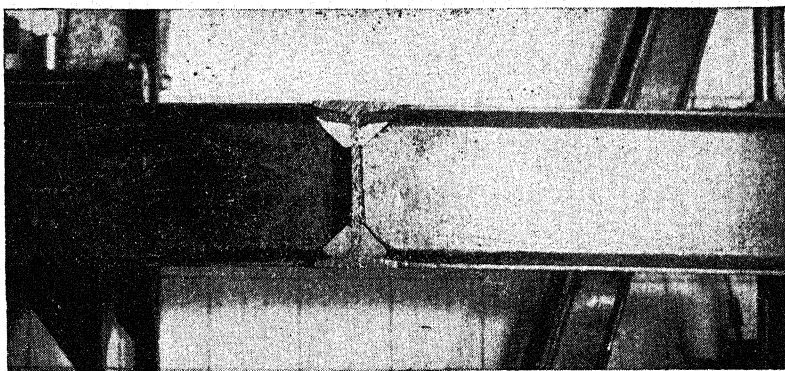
Test of welded steel grid. Beam notched at web in line with flange butt weld—before test.
